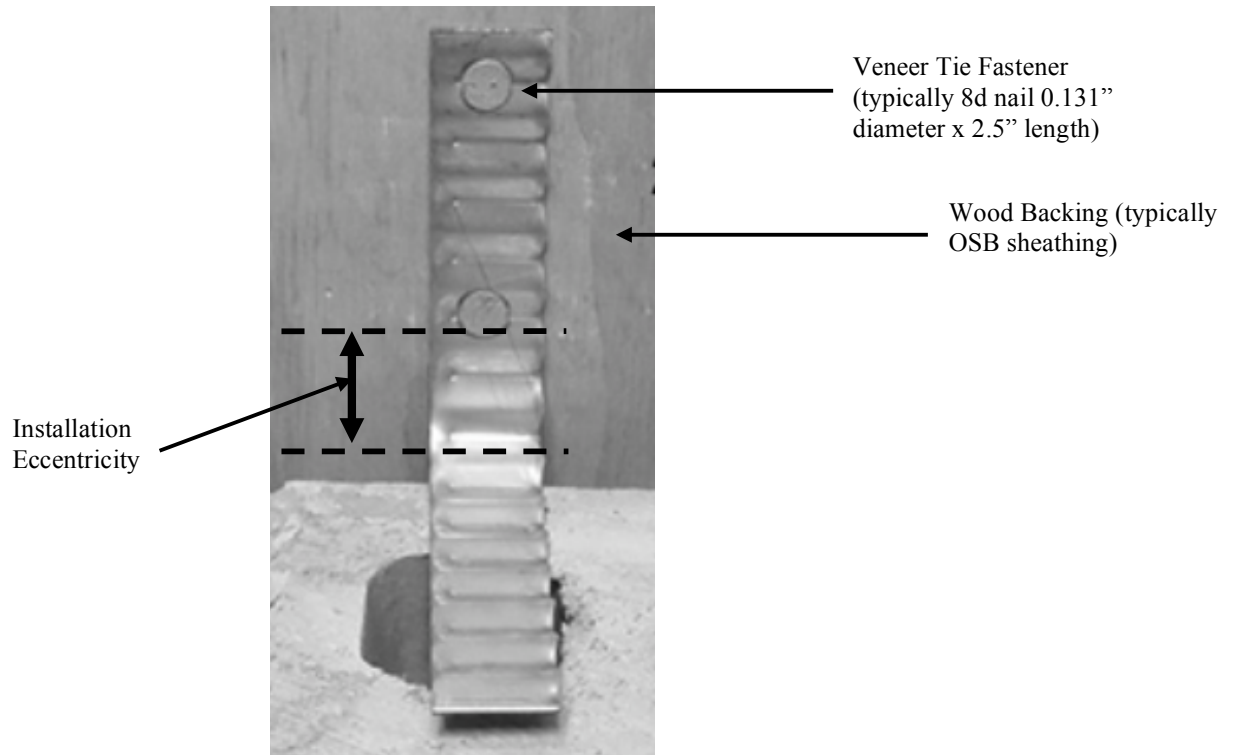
Commonly used corrugated brick veneer tie in installed position. (Heckmann Building Products, 2018)
